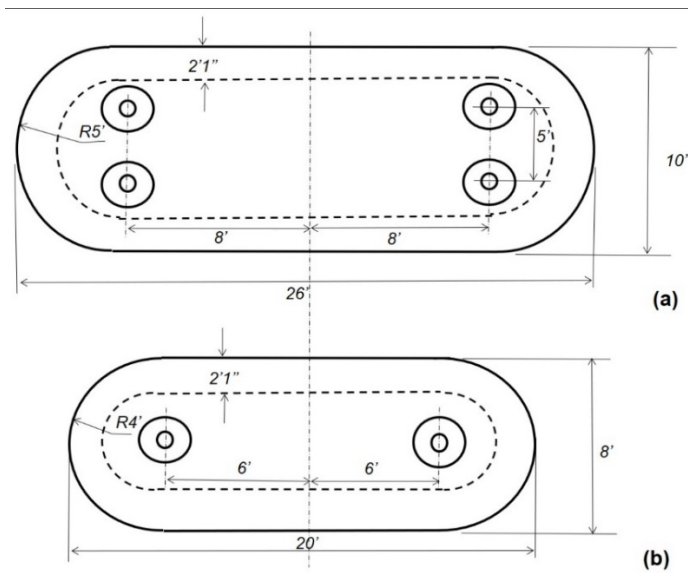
Top cross-section geometries of the piers: (a) for simply-supported concrete box-girder, where 4 V-connectors are located for the two end parts of the two adjacent girders; (b) for continuous orthotropic box-girder, where only 2 V-connectors are located because of the carried continuous girder.
